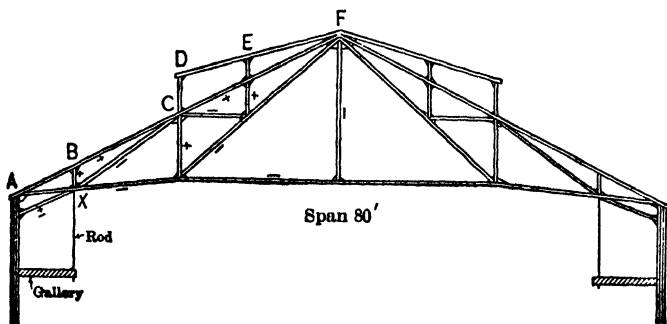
Fink Truss with Vertical Struts, for Drill-hall. Span Eighty Feet
